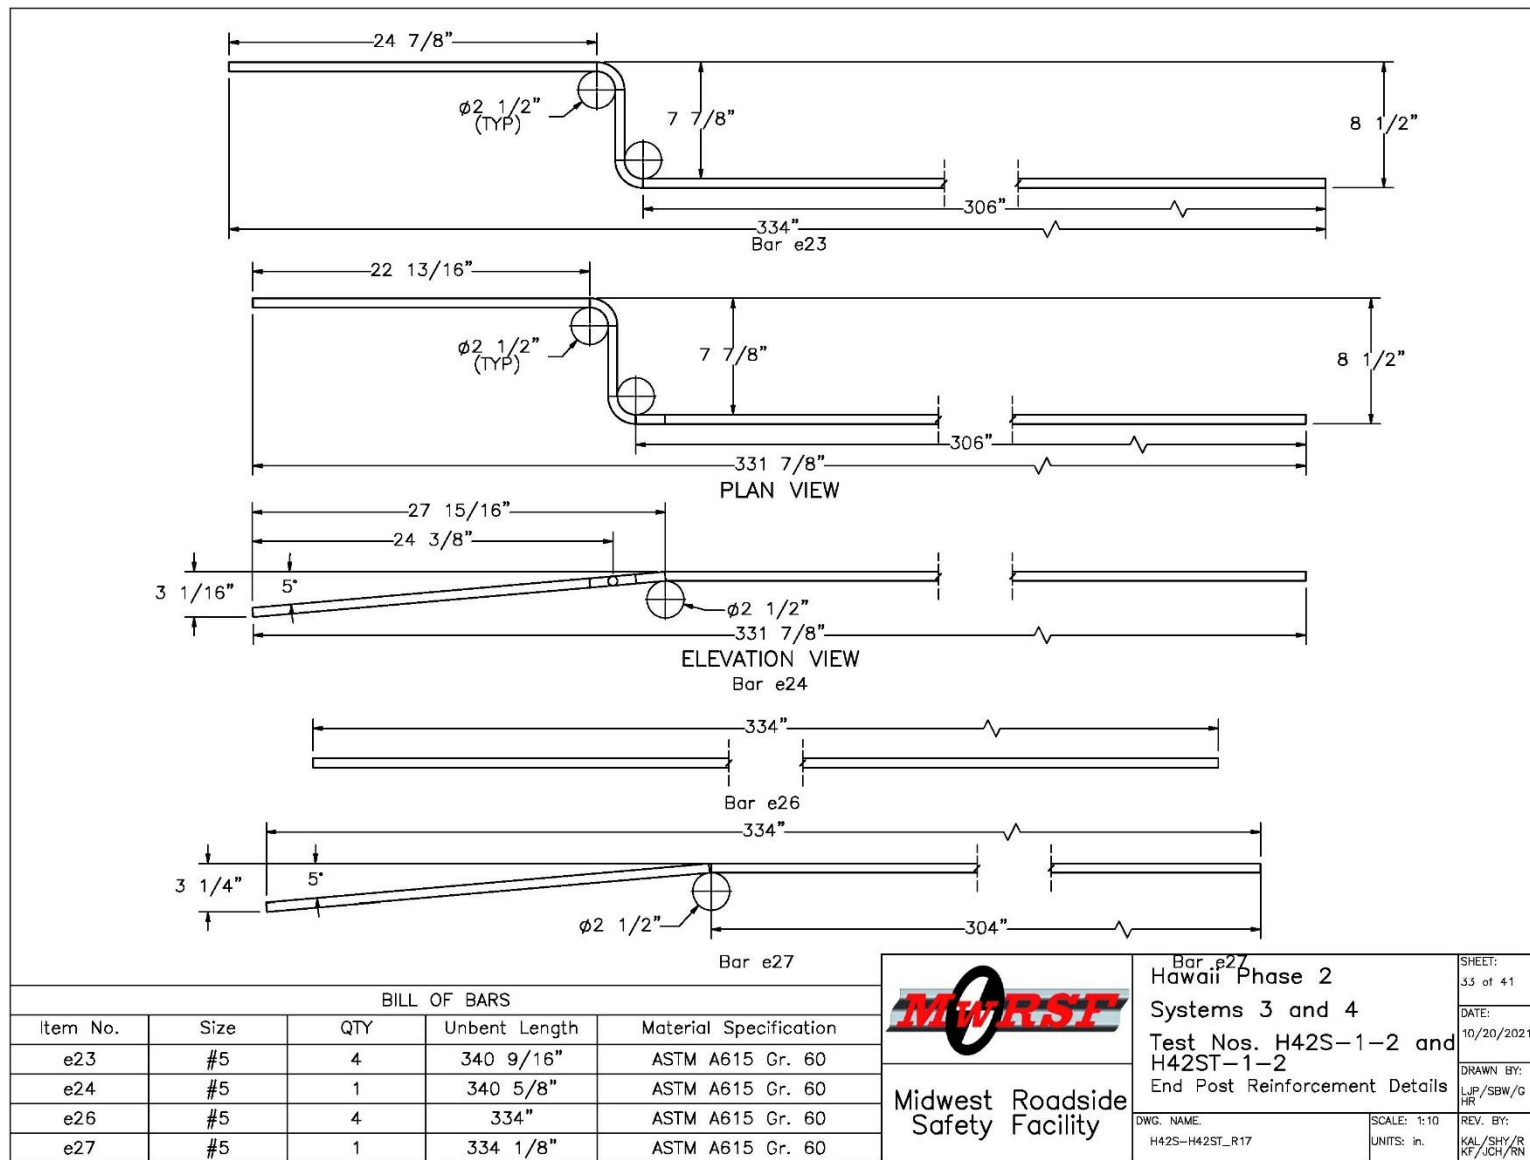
Endpost Reinforcement Details, Test Nos. H42S-1 and H42S-2
